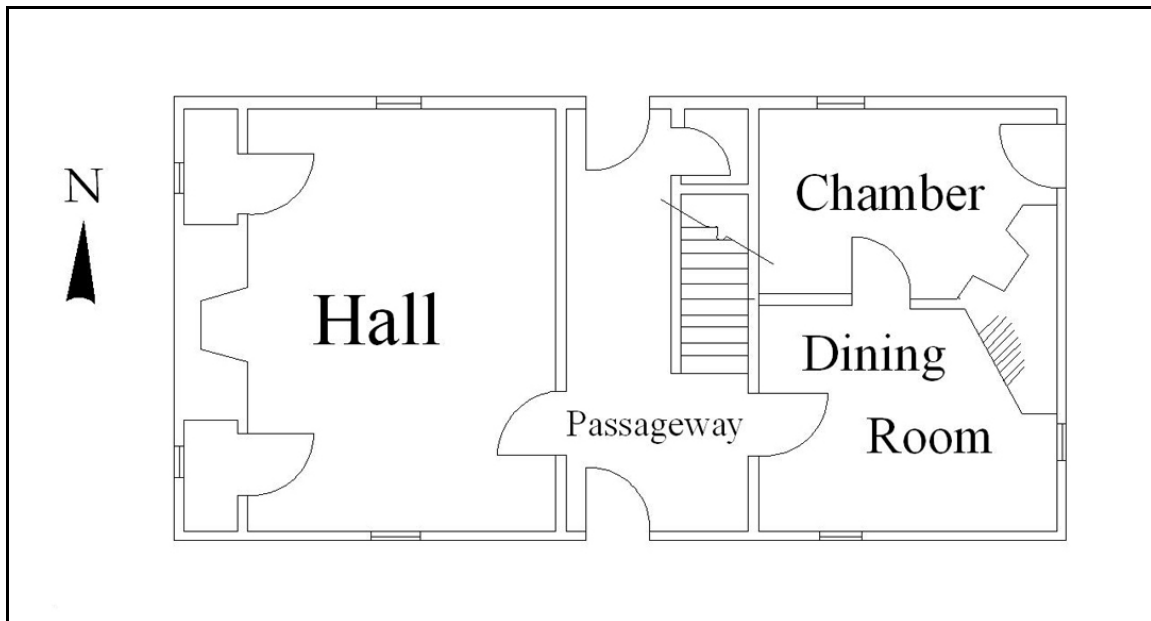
The first floor plan of the Billups House, Mathews County, Virginia (built c. 1790; redrawn from Upton 1982:98).
